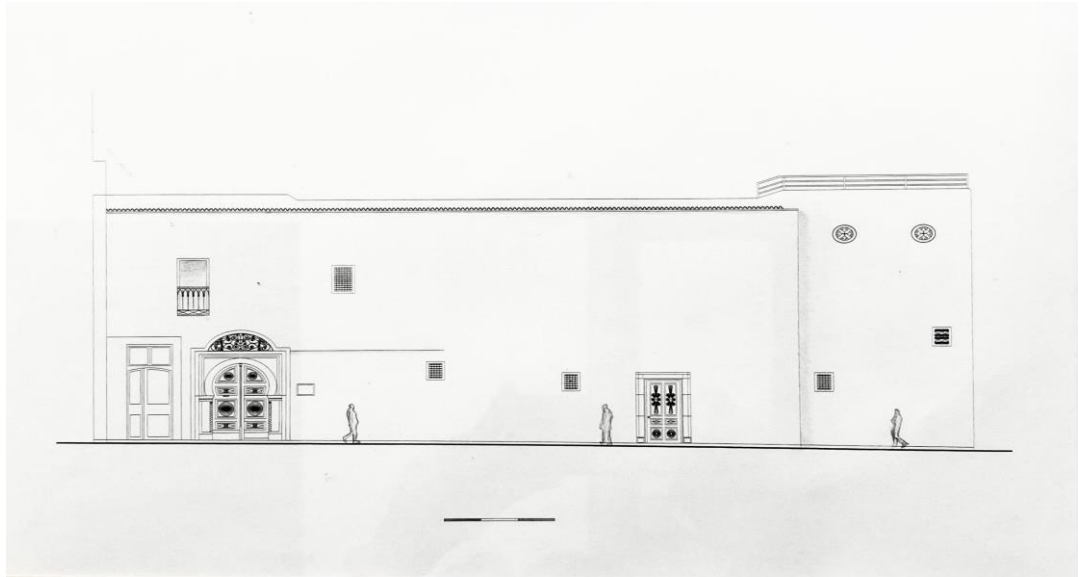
Facade Plan of Dar Ben Gacem. (Credits: ASM)
